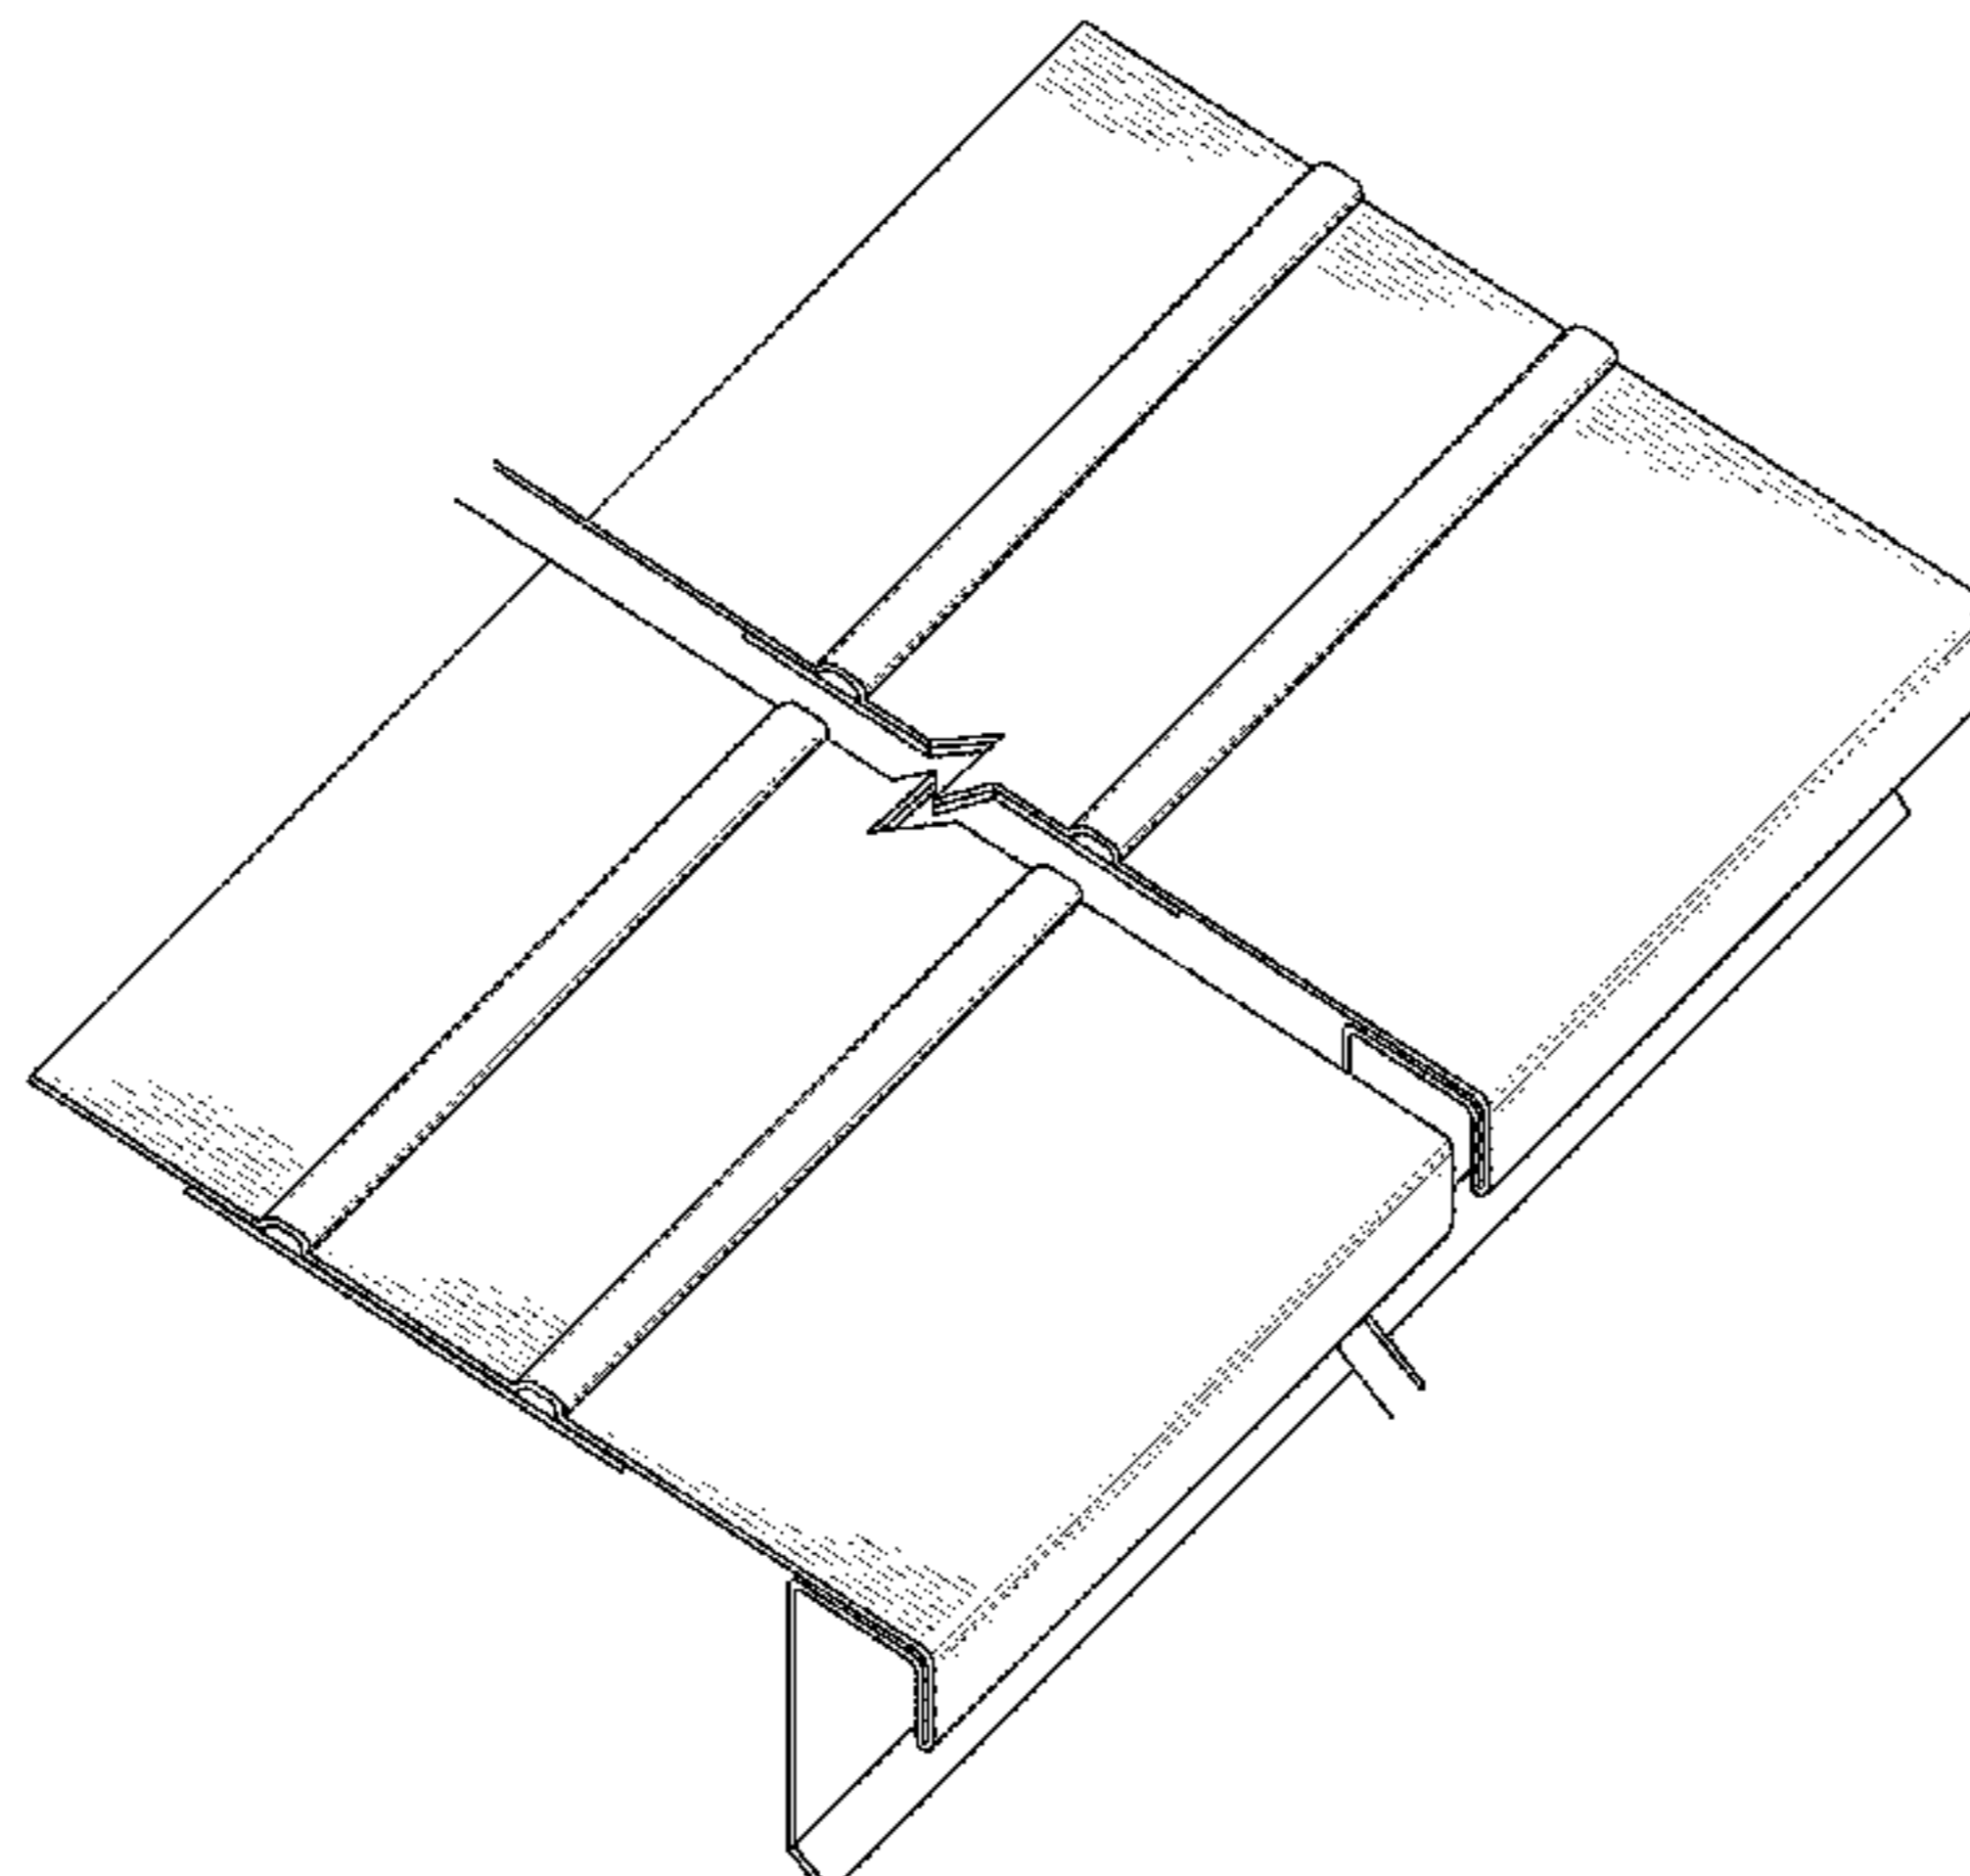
is a top perspective view of the drip edge, showing my new design;
